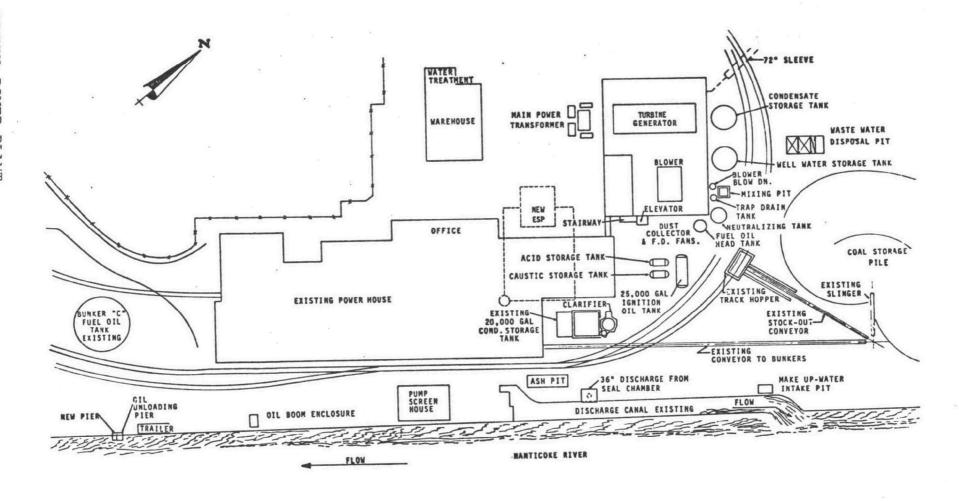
Site plan showing possible location of a new ESP for Boiler 7 at the Vienna power plant.
